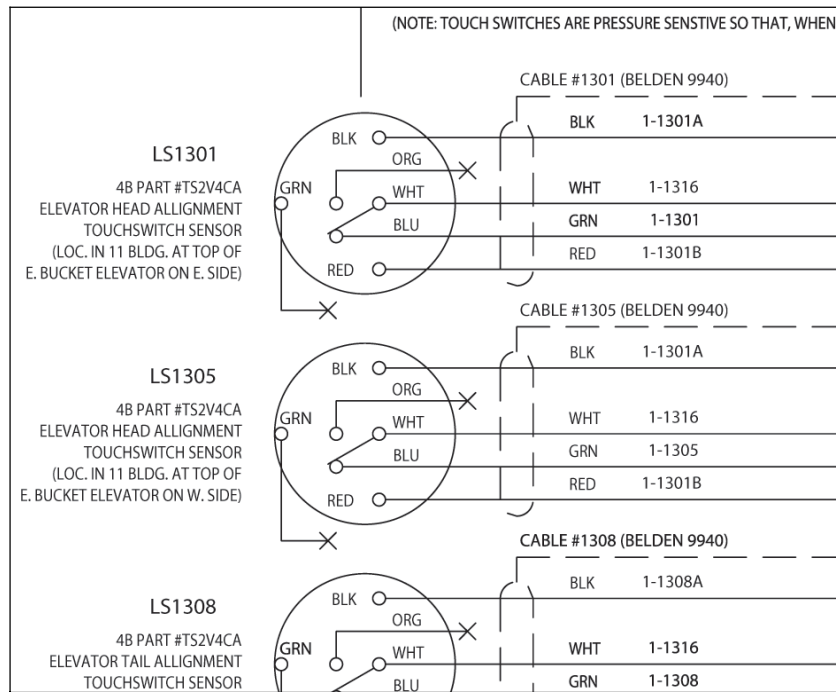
Example of typical wiring diagram detail (partial schematic shown).
